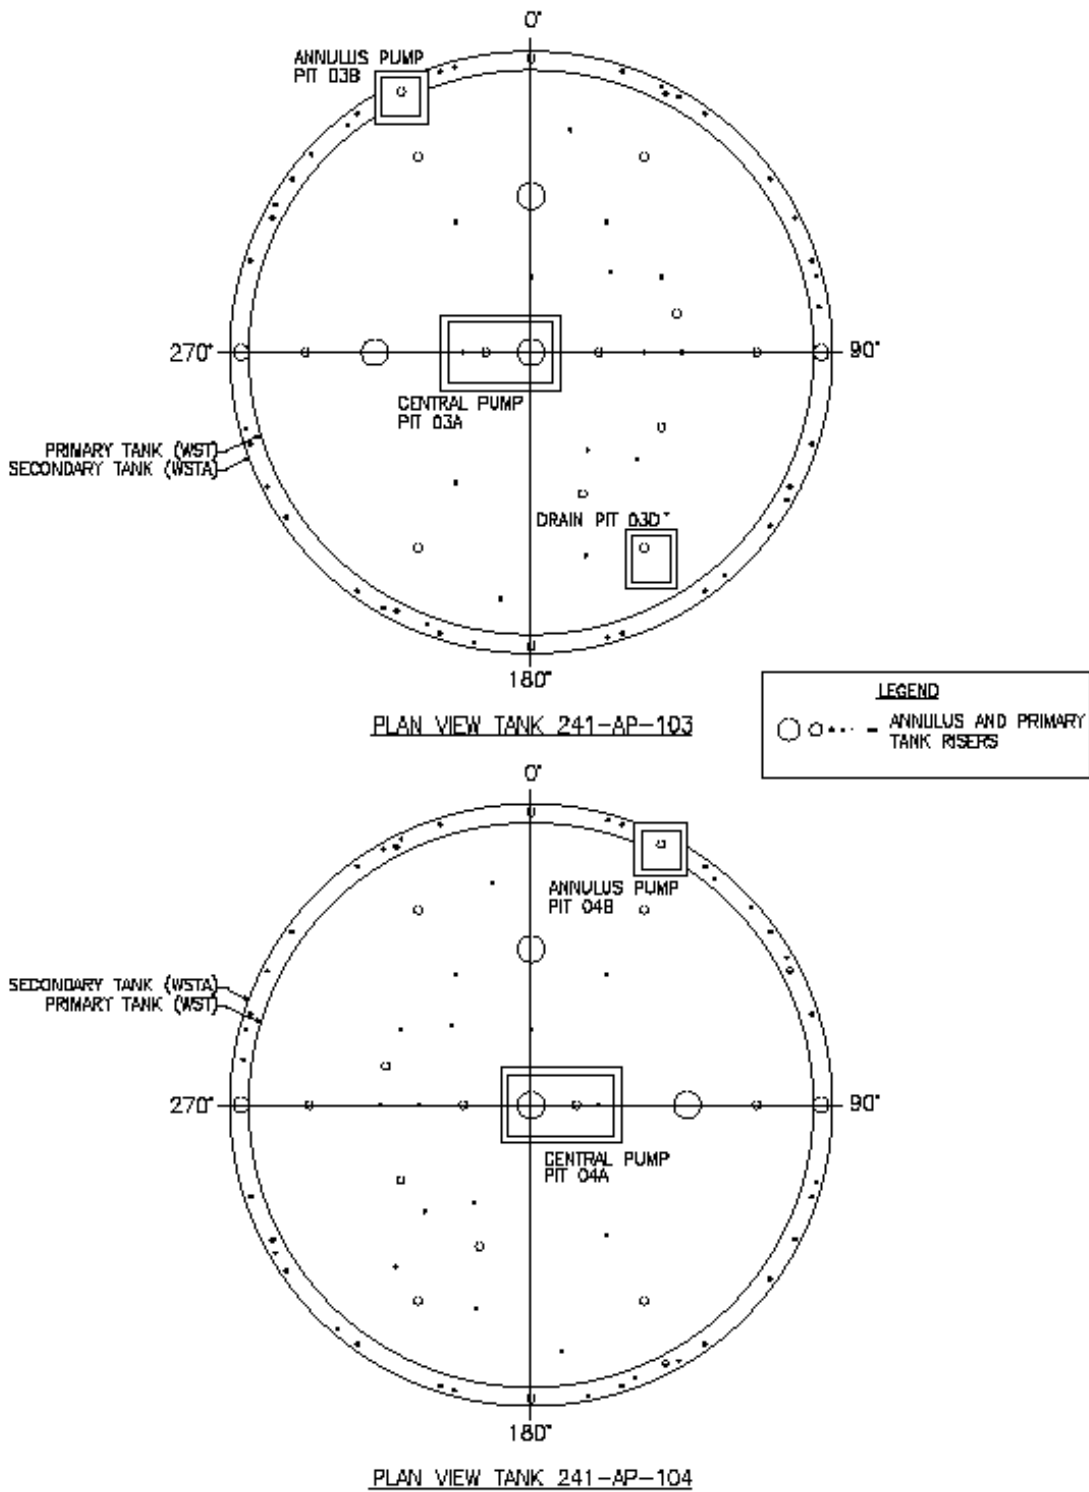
Plan View Double-Shell Tanks 241-AP-103 and 241-AP-104
